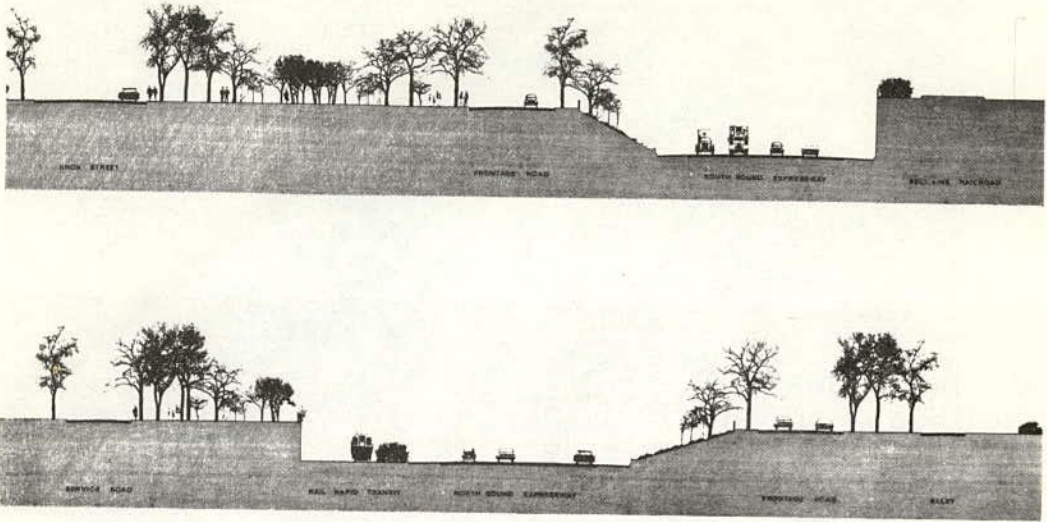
Cross section of the divided alignment: (above) East roadway; (below) West roadway.
